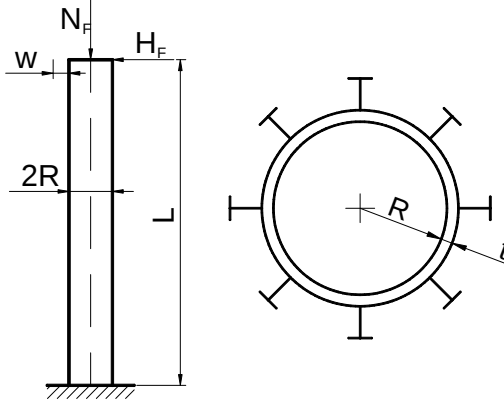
A cantilever column and its cross-section of stringer-stiffened circular cylindrical shell
